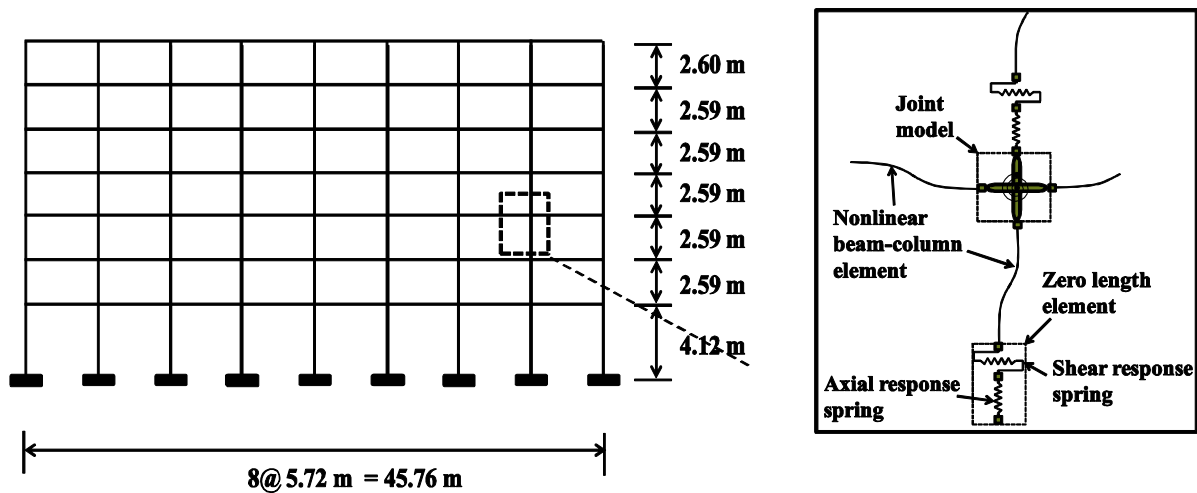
South frame elevation and column, beam and joint models (adapted from Krawinkler, 2005)
